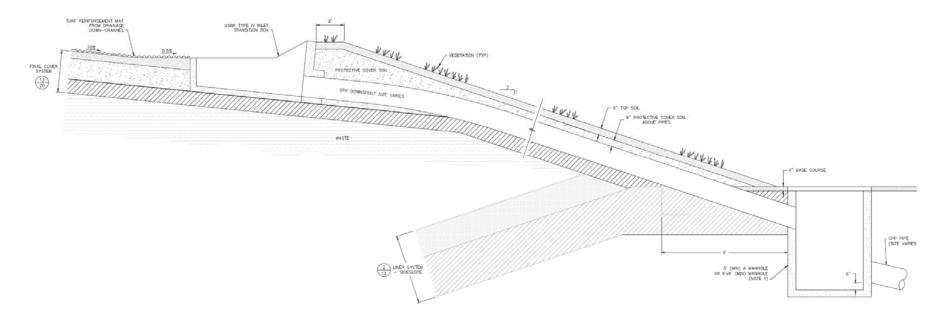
FINAL COVER SYSTEM INLET BOX, DOWNSPOUT, AND MANHOLE
